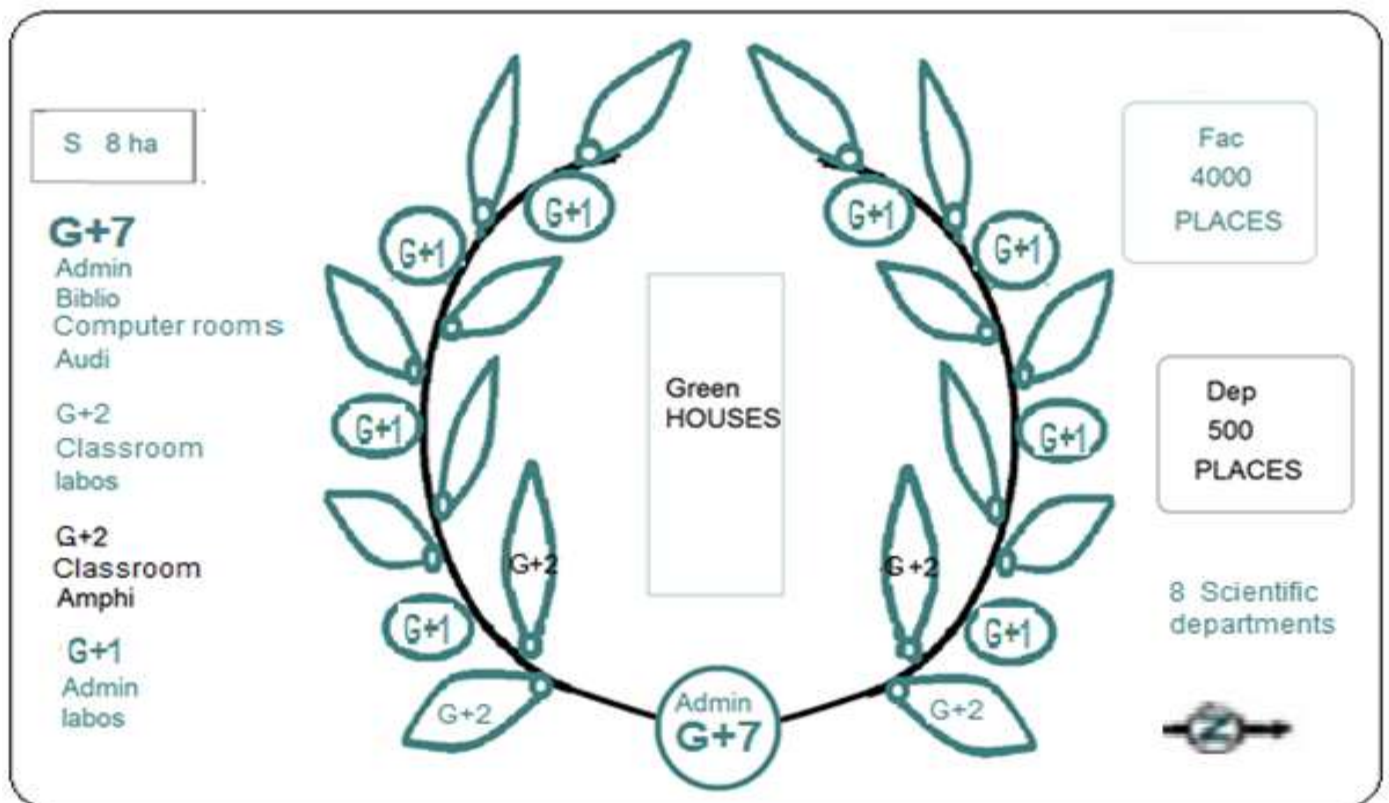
Model in plan of an olive branches faculty(Source.Author.2024).
